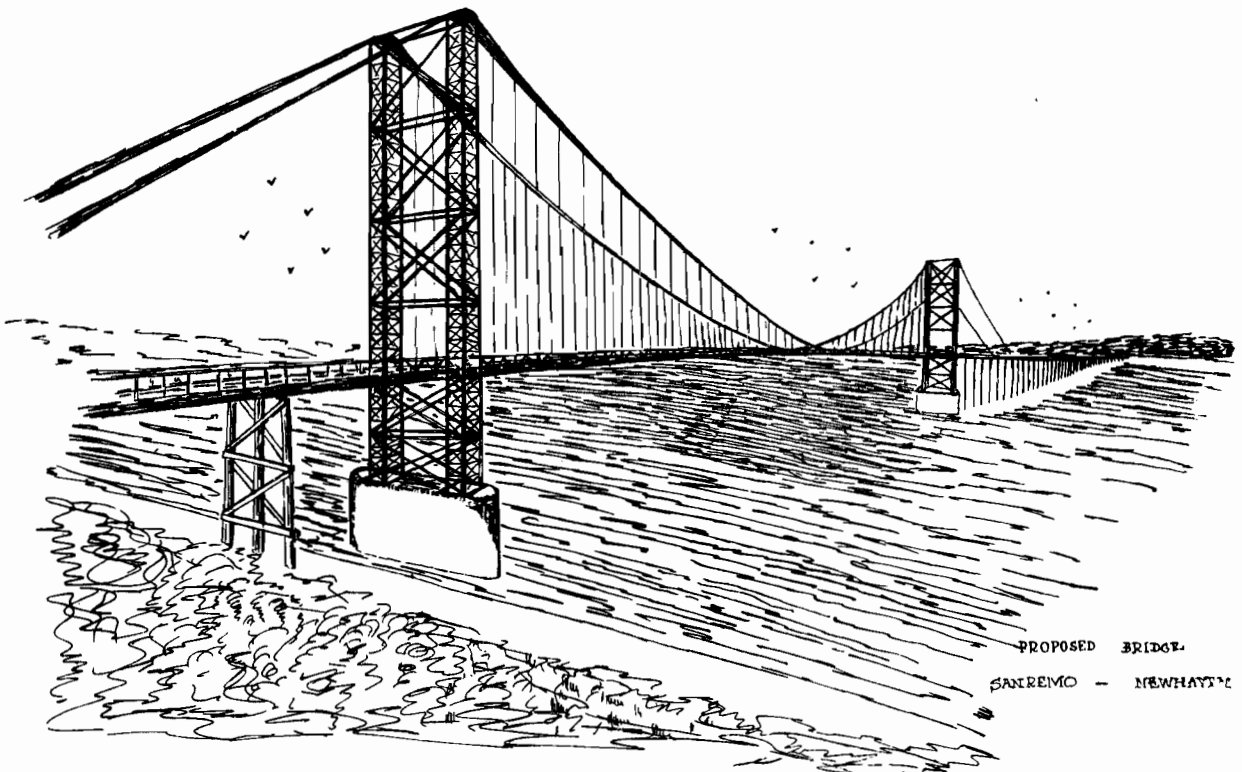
Sketch of proposed new bridge over the channel between Newhaven and Phillip Island.
